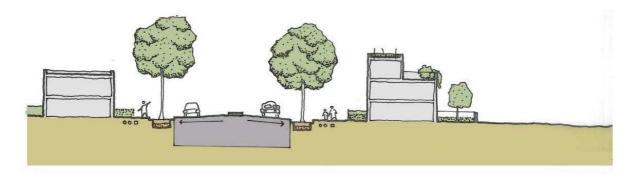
Street design to drain to adjoining lower ground SuDS feature
